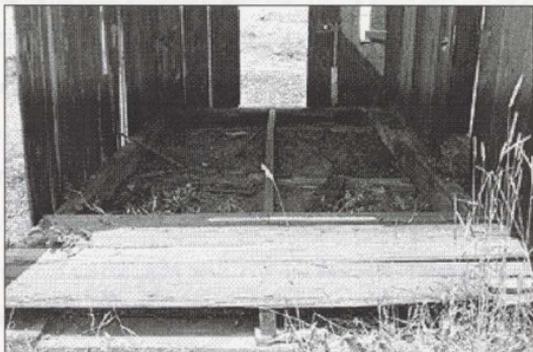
Visitor's House. South Elevation, Detail of the Floor Structure.
